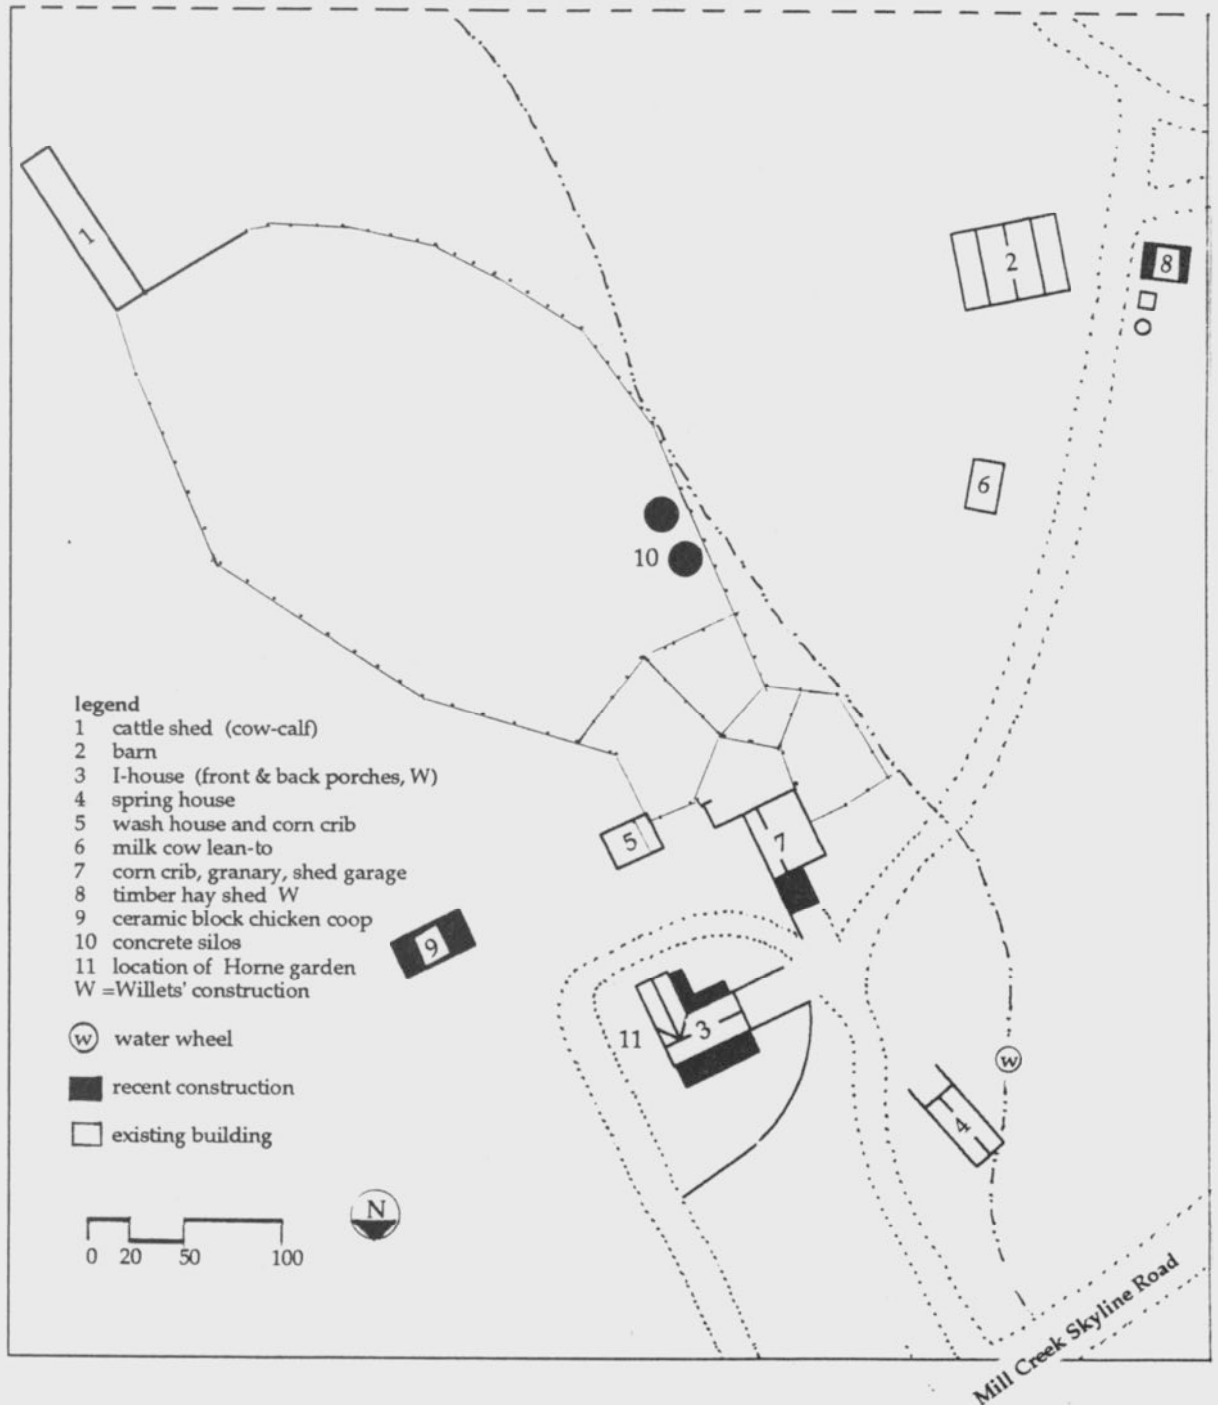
Site plan, Charles Horne, Sr.'s I-house and outbuildings, 1919-1931
